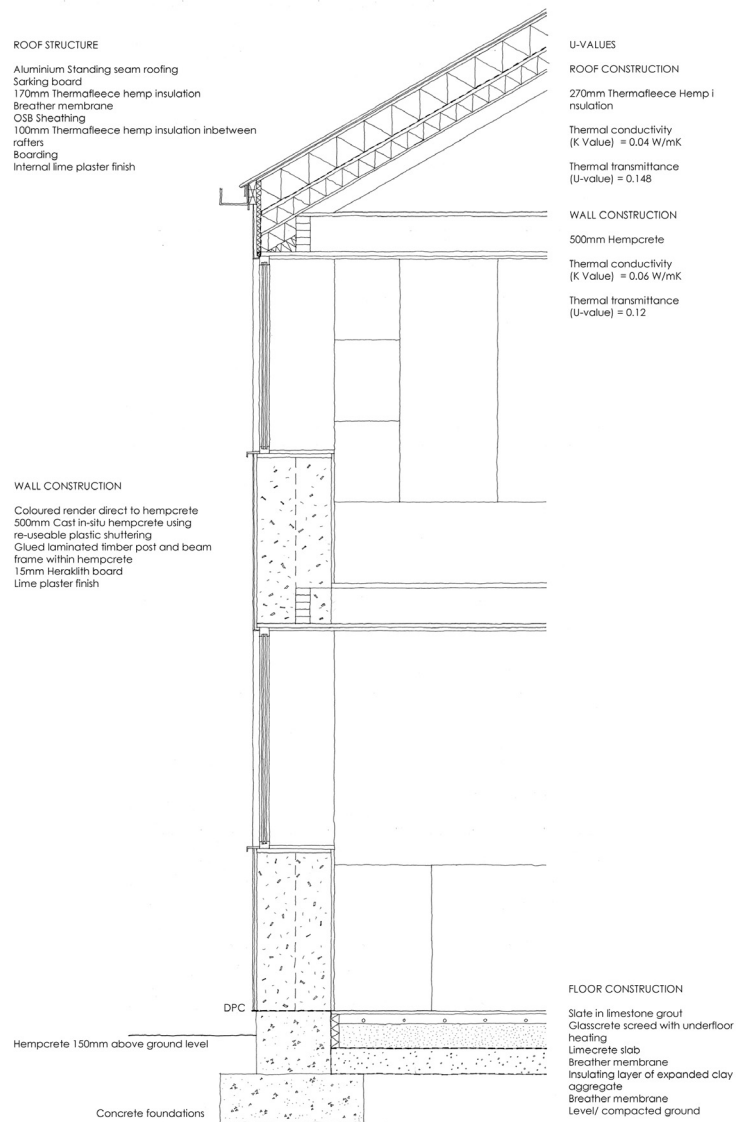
Construction section using hempcrete through the kitchen and bedroom of 3 bed house type
